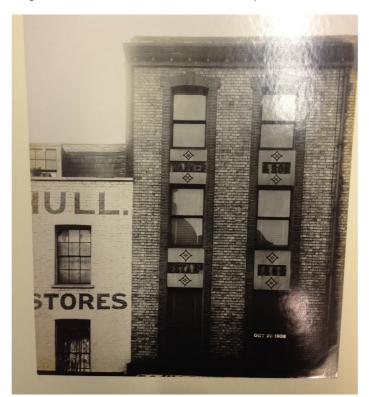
No. 52TCR - Photo of Elevation - Early 20C
